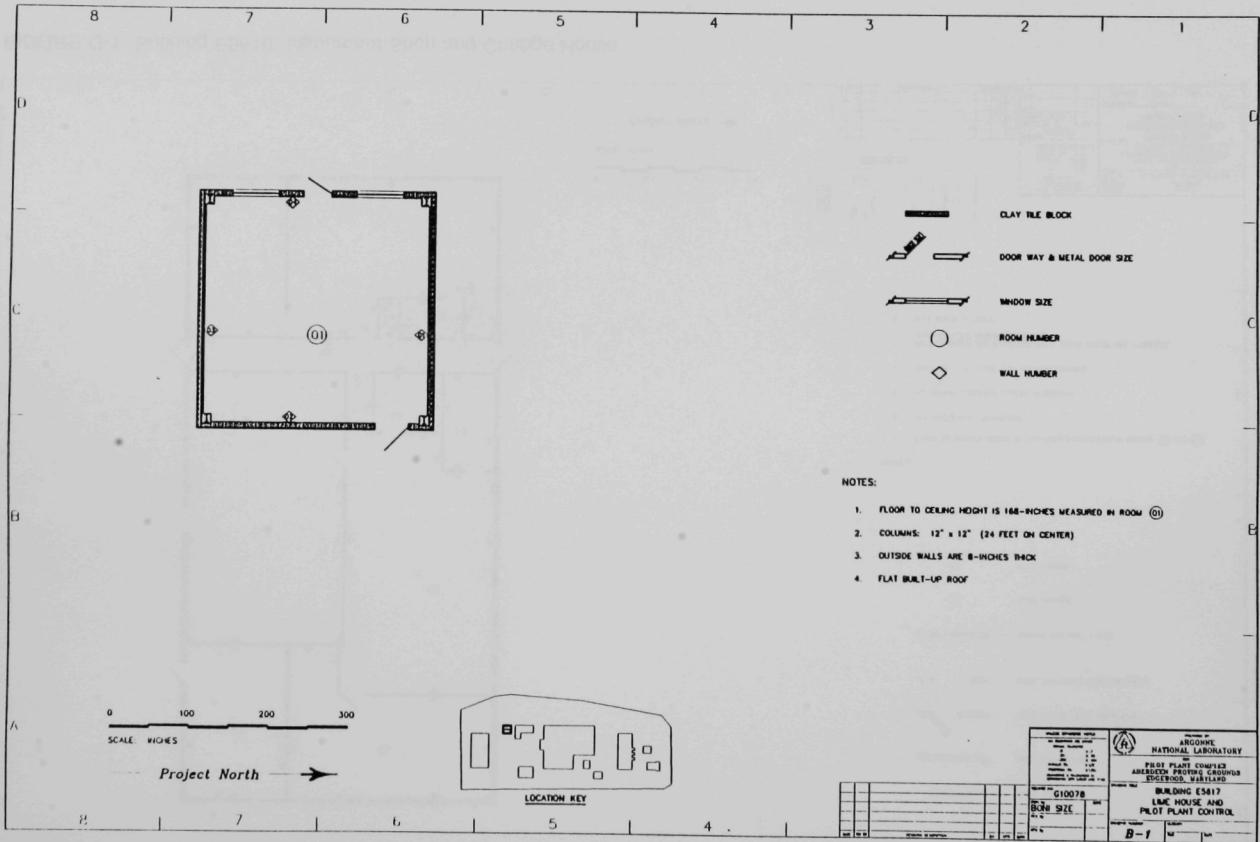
Building E5617, Lime House and Pilot Plant Control
